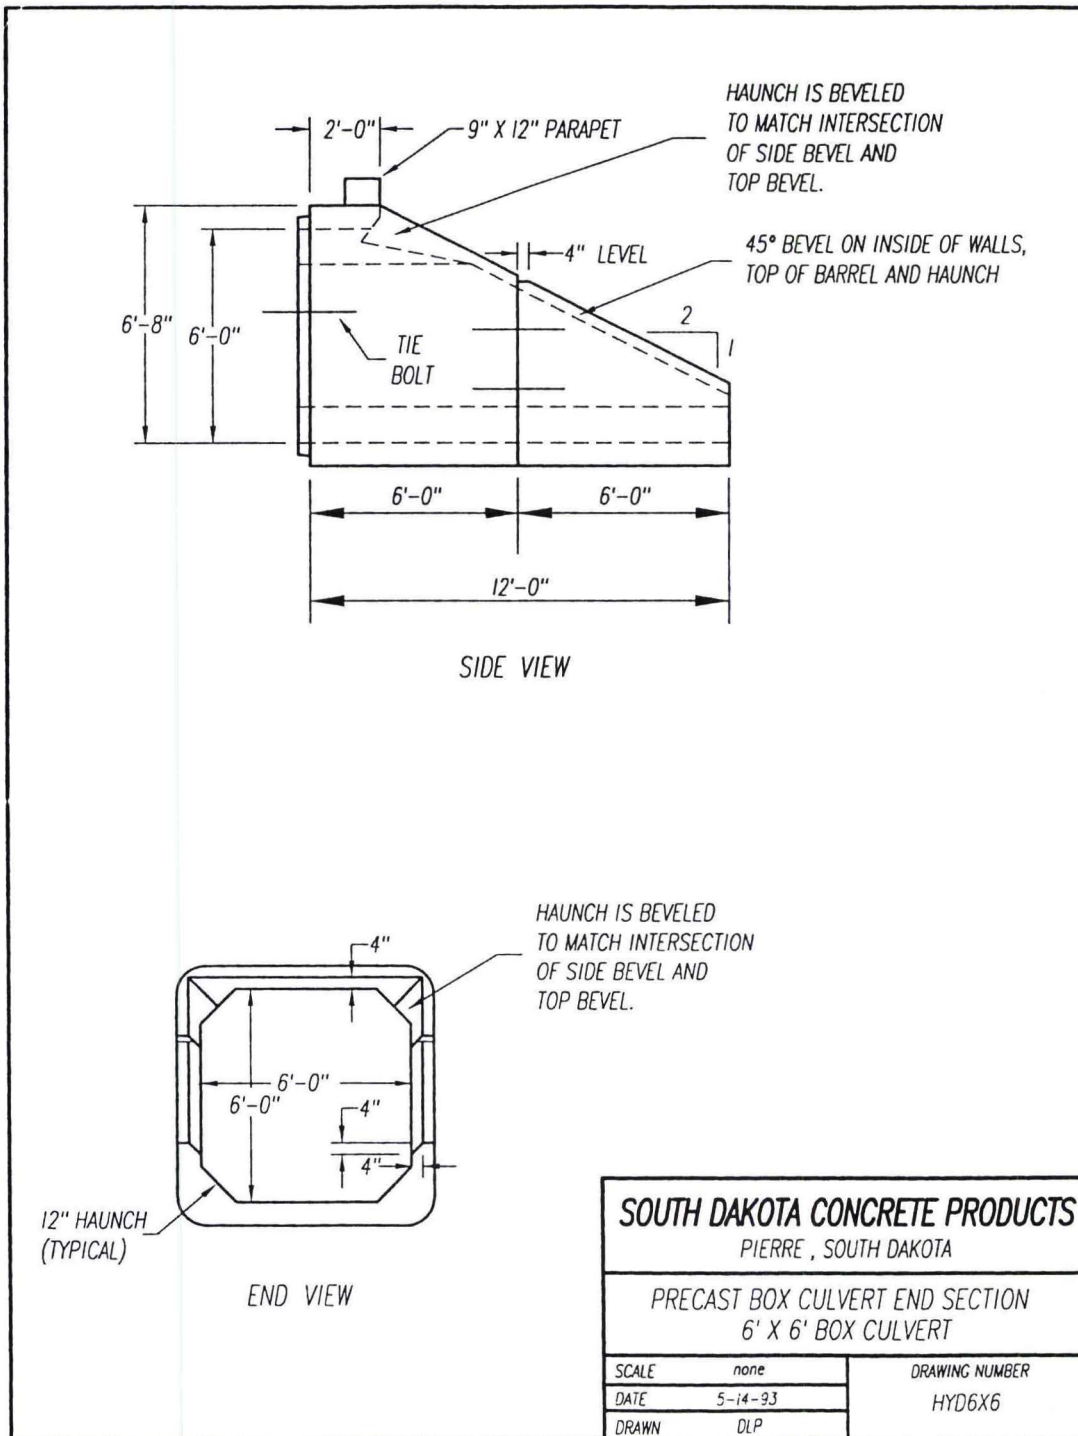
Schematic of the South Dakota precast culvert end section, 6 ft x 6 ft box (tested by culvert model 5).
